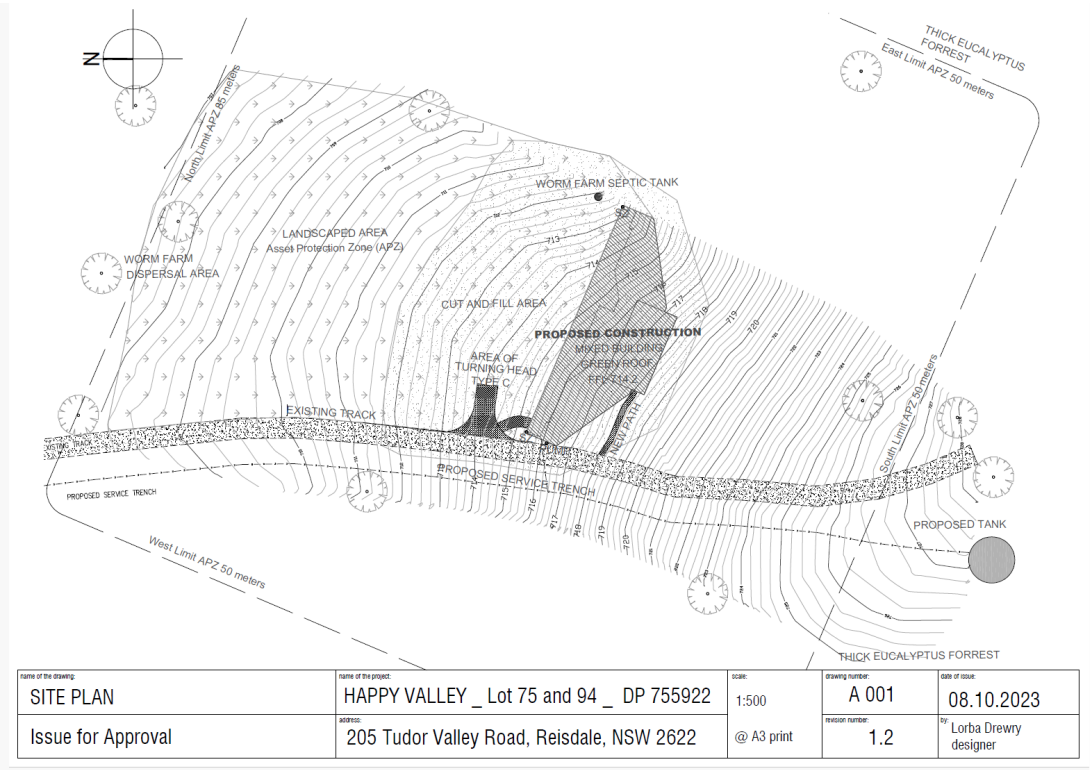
Proposed site plan (Lorba Drewry designer, 2023)
